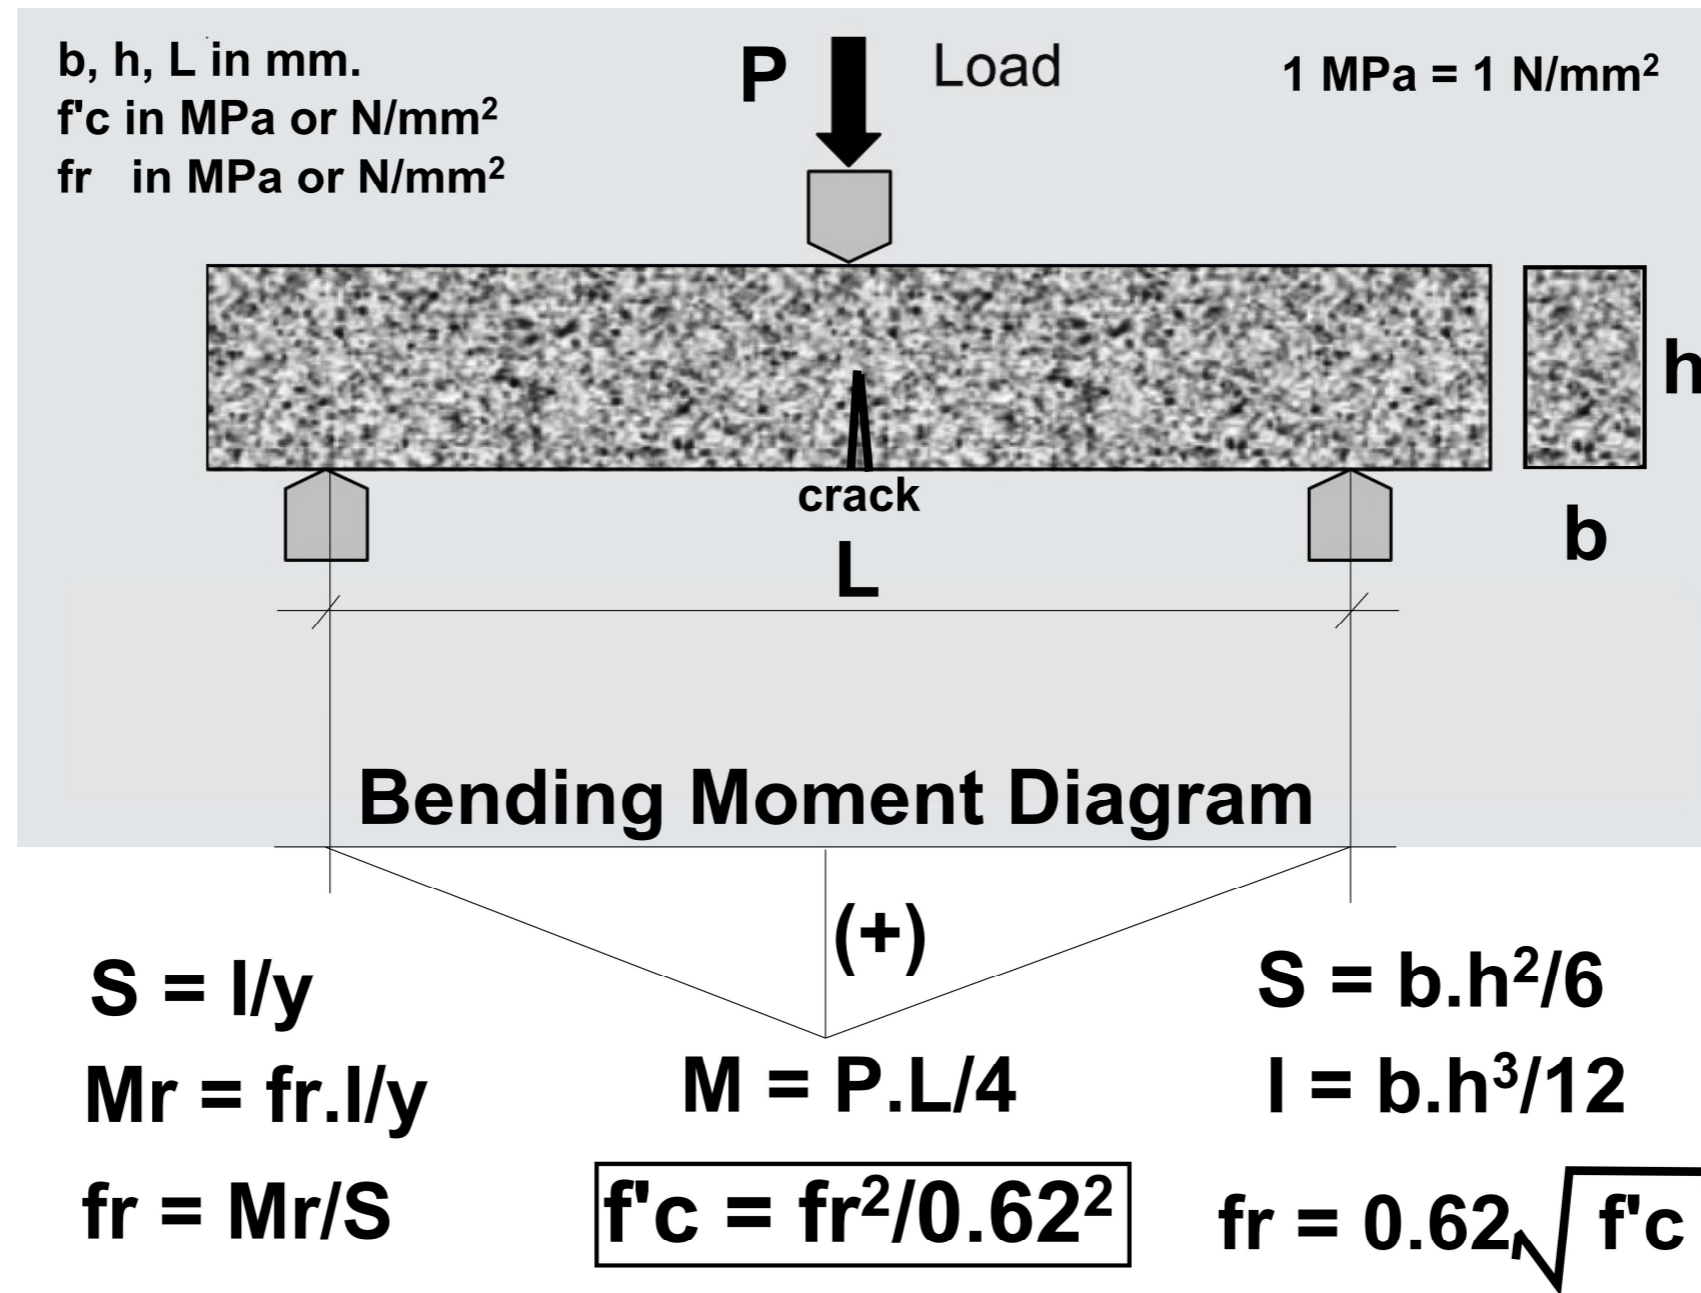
Typical 3-Point set-up of Flexural Testing of Concrete samples with Geometrical Design and Strength Parameters.
